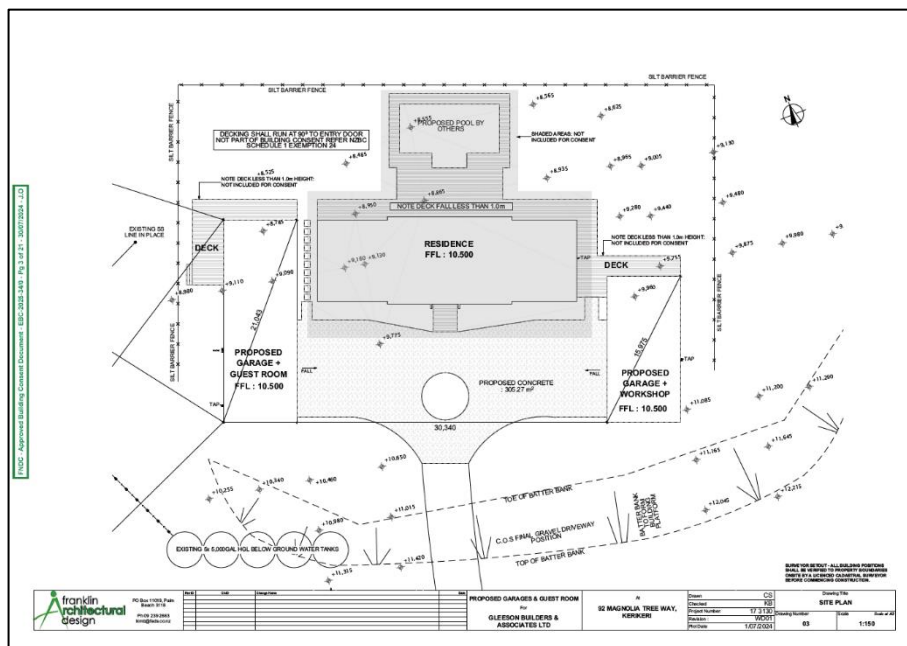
Site Plan [Source: Franklin Architectural Design]
